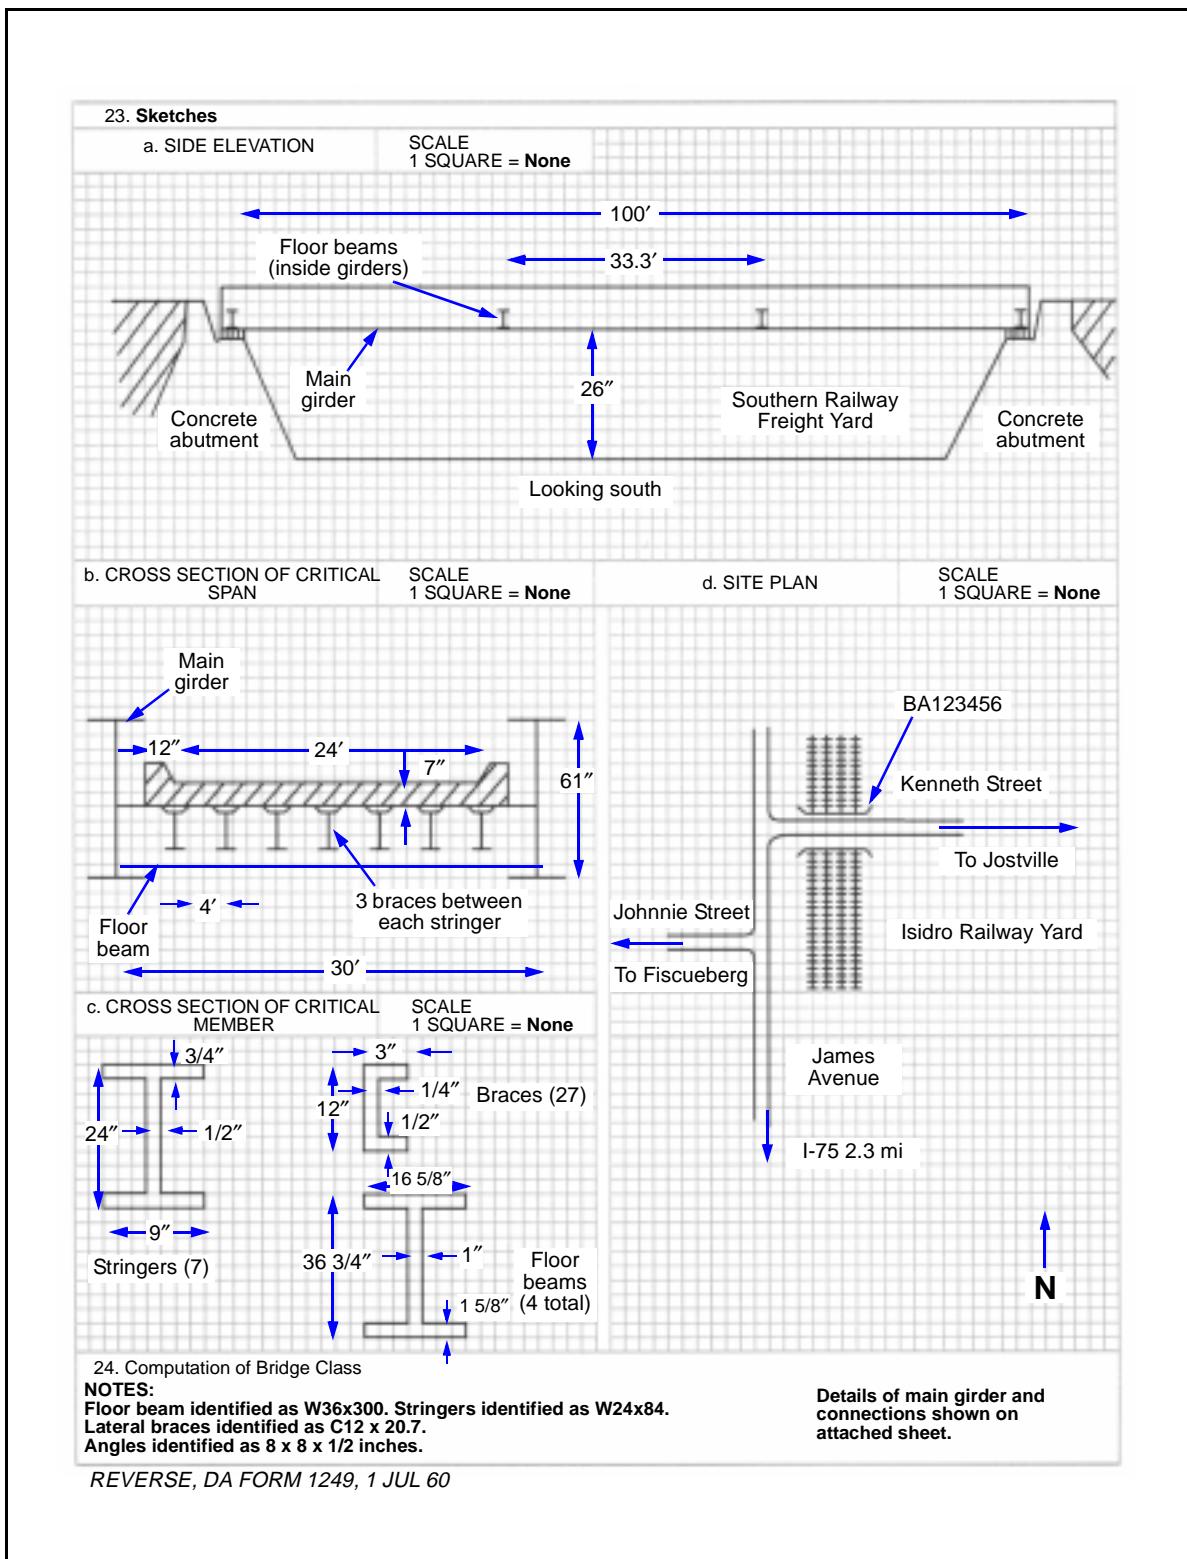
Sample Bridge-Reconnaissance Report for a Steel-Girder Bridge
